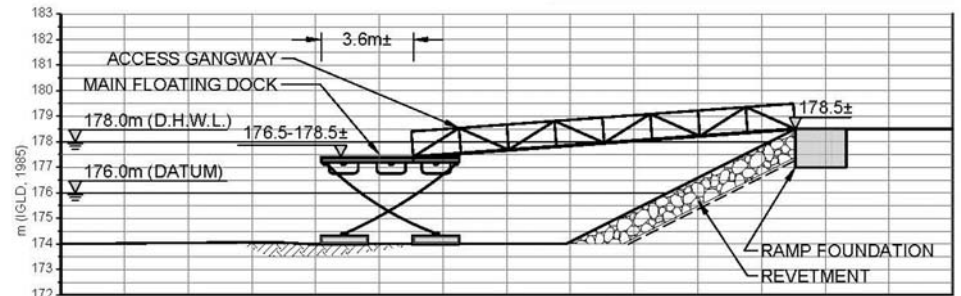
Typical Small Boat Dock and Ramp Cross Section
